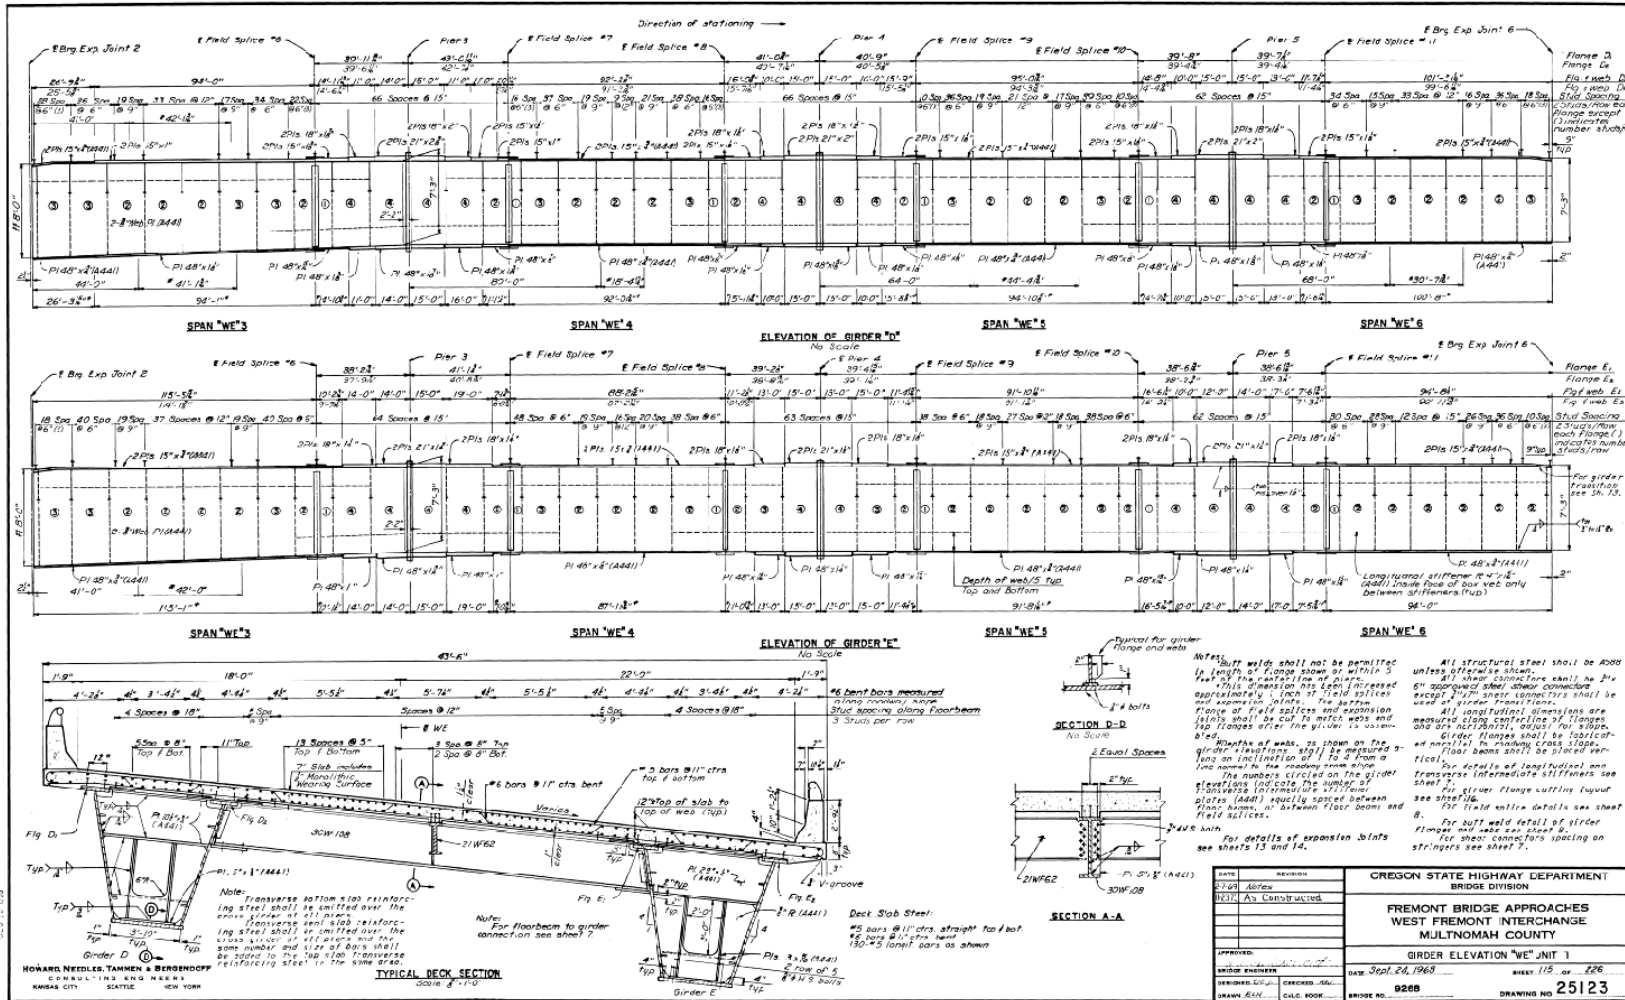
Structural details of WE Unit 1 Bridge superstructure 09268E.
